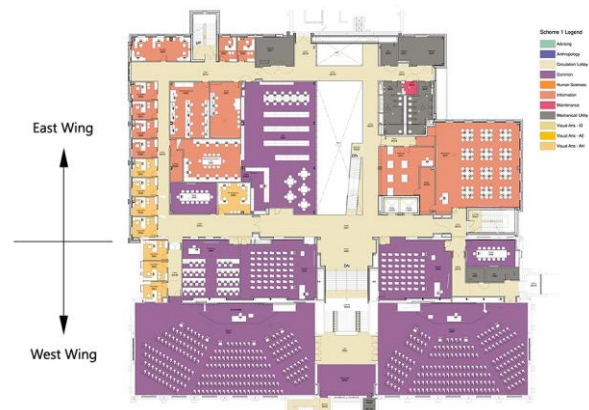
WJB Second Floor Plan showing two former formal dining rooms converted onto lecture halls. Drawing courtesy of Gould Evans Architects.
